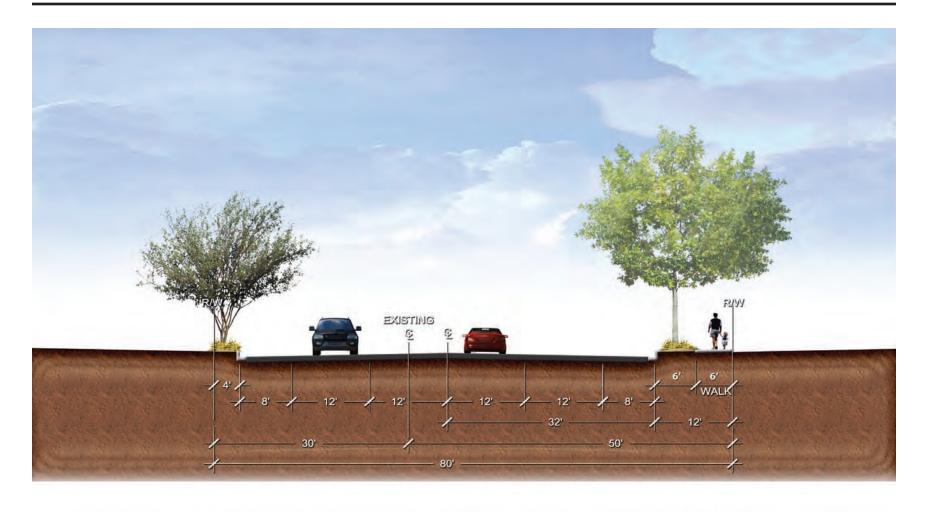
| Themed Road(s) - D Section (80' R.O.W.)
